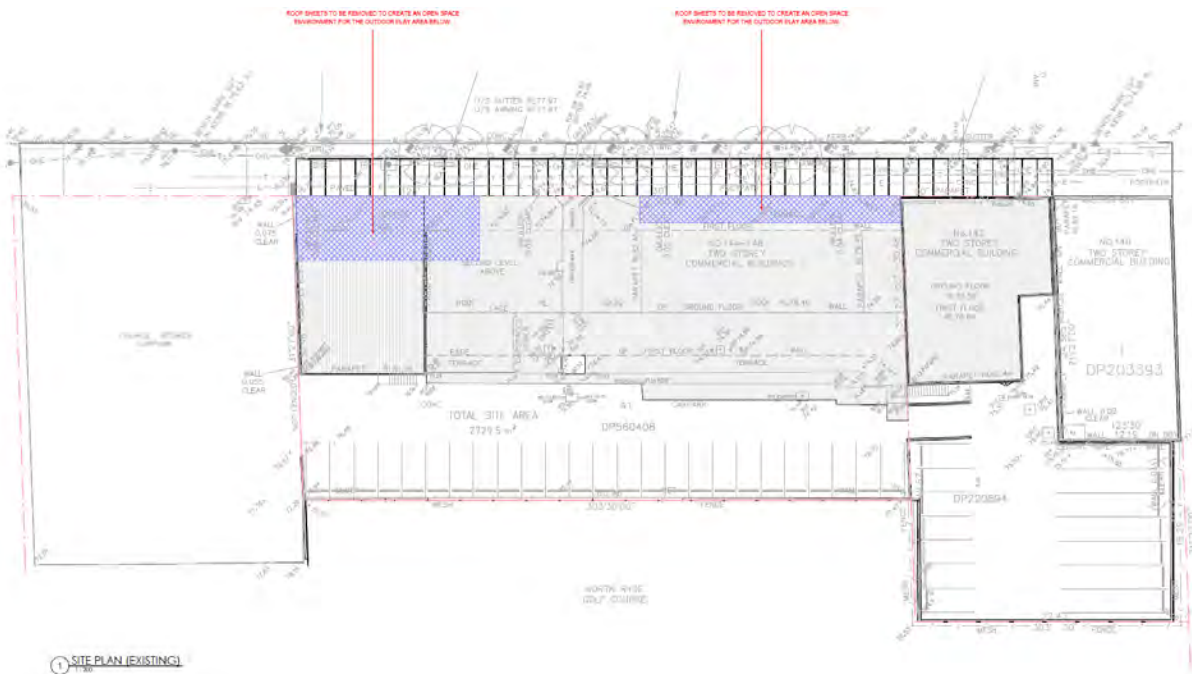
Roof sheets to be removed to facilitate outdoor play areas 1 and 2.
